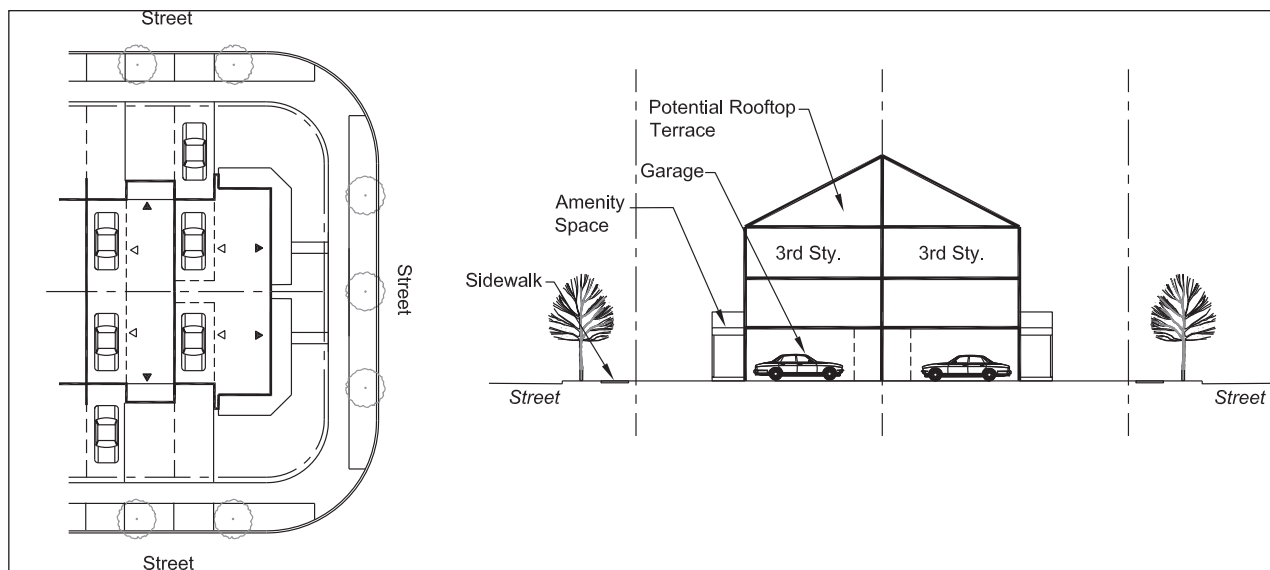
Conceptual Plan View and Cross-Section of Back-to-Back Townhouses
